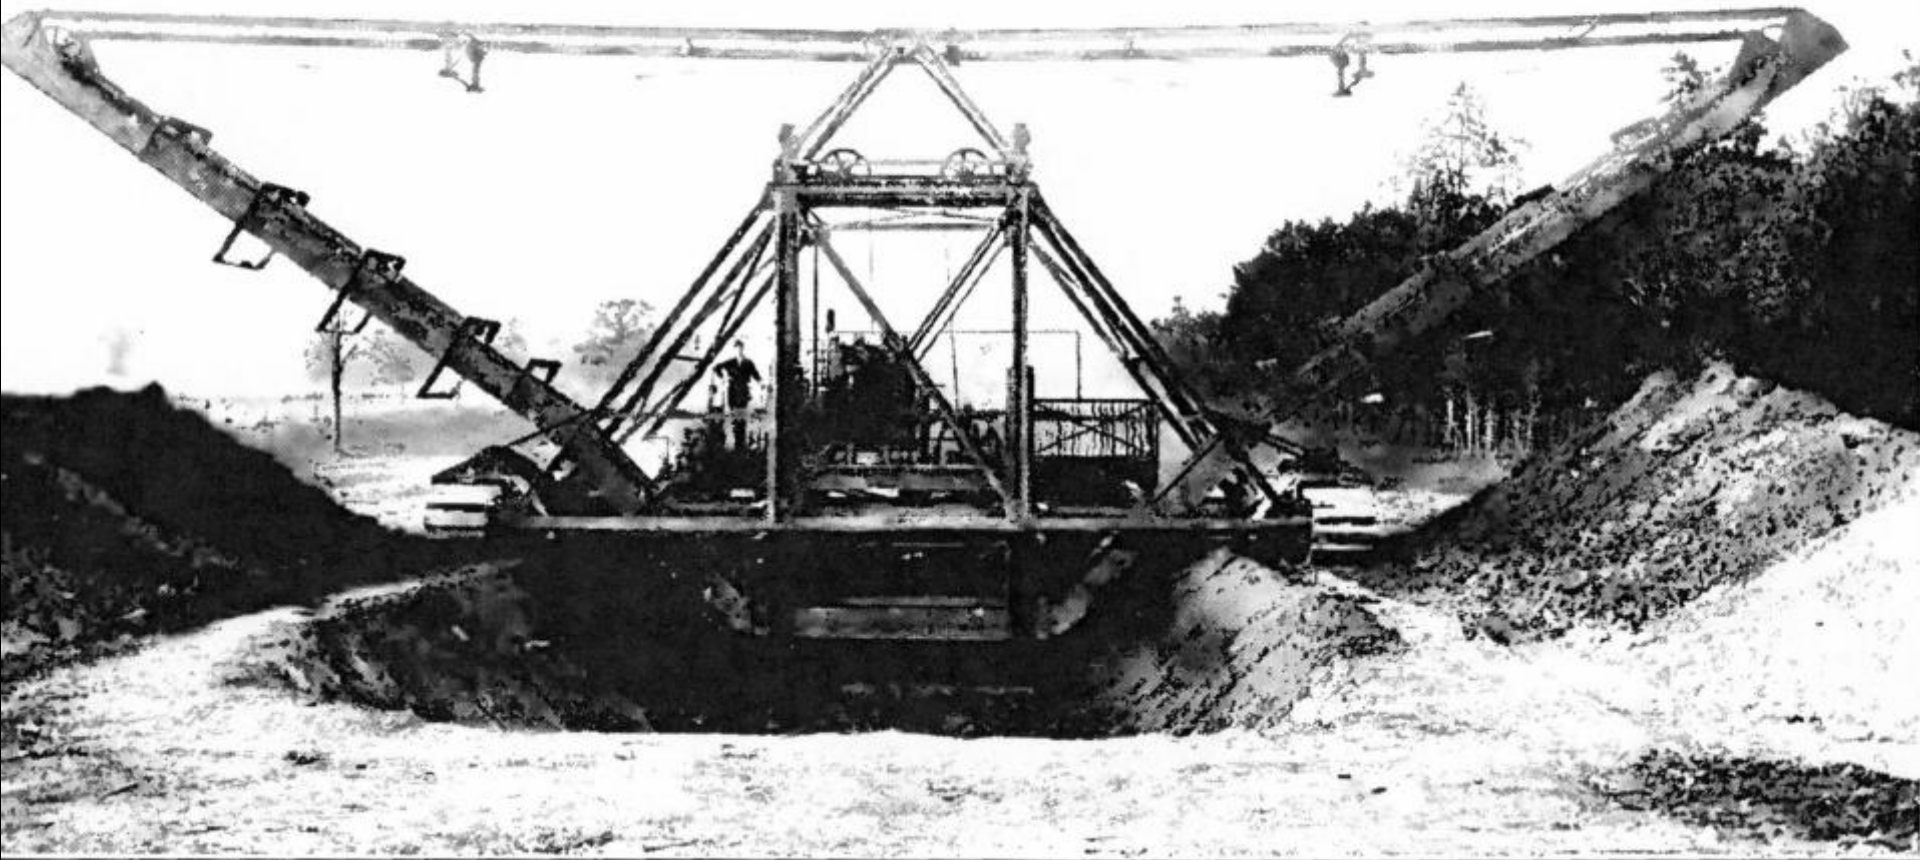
A Dry Land Dredge or Excavator Constructing a Wide Bottom Drainage Ditch.
